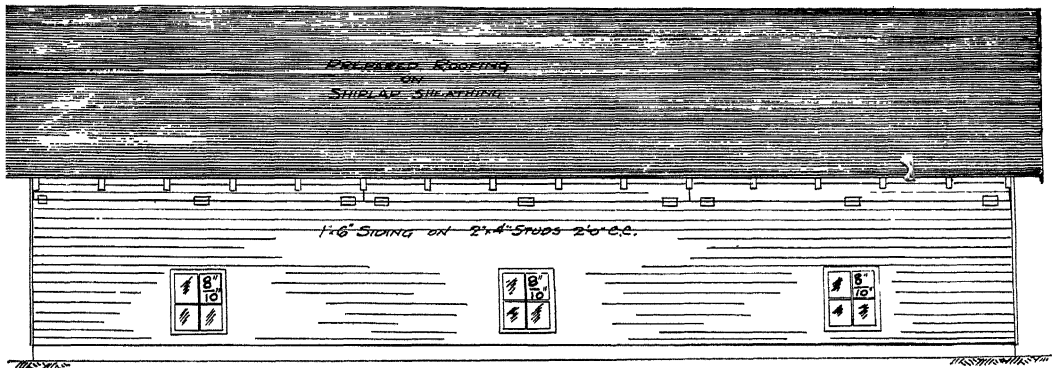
Rear elevation. The doors just under the plate are 12 inches wide and 10 feet long. The windows should be hinged at the top, so that when opened they may be fastened up to the underside of the dropping boards.
